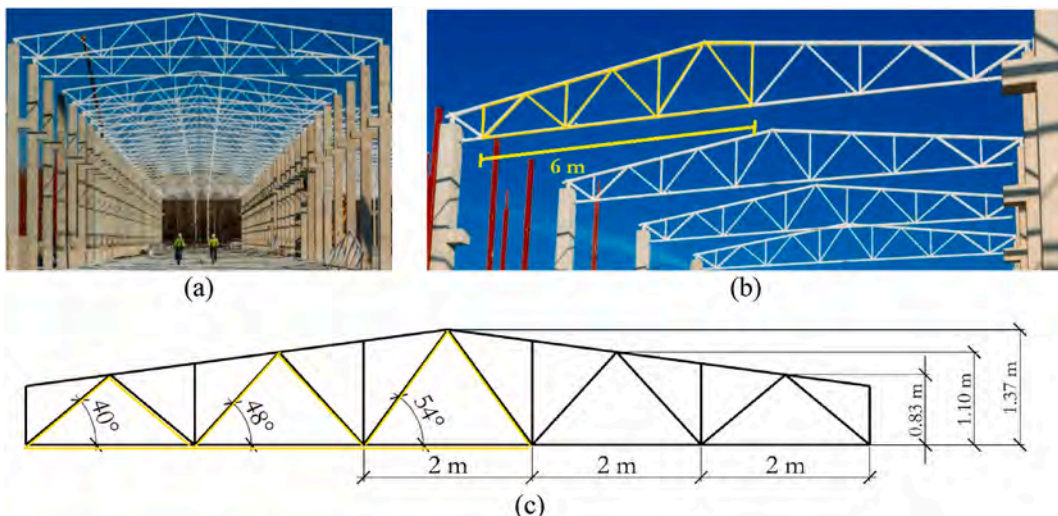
Case study library 2: reclaimed triangular components from sloped Warren trusses; (a,b) images of example truss [51] and (c) used truss dimensions.
